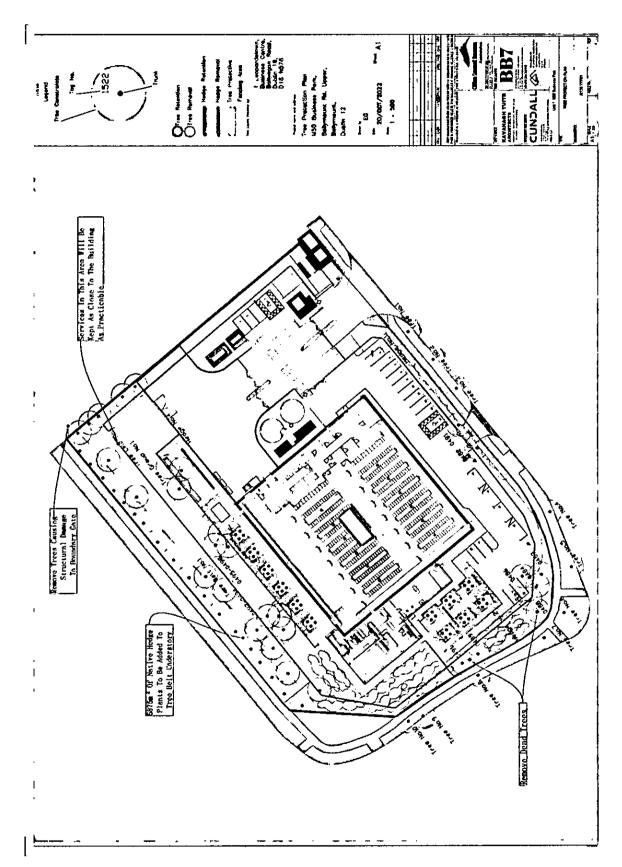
Showing the Proposed Development landscape plans with removal of trees indicated.
